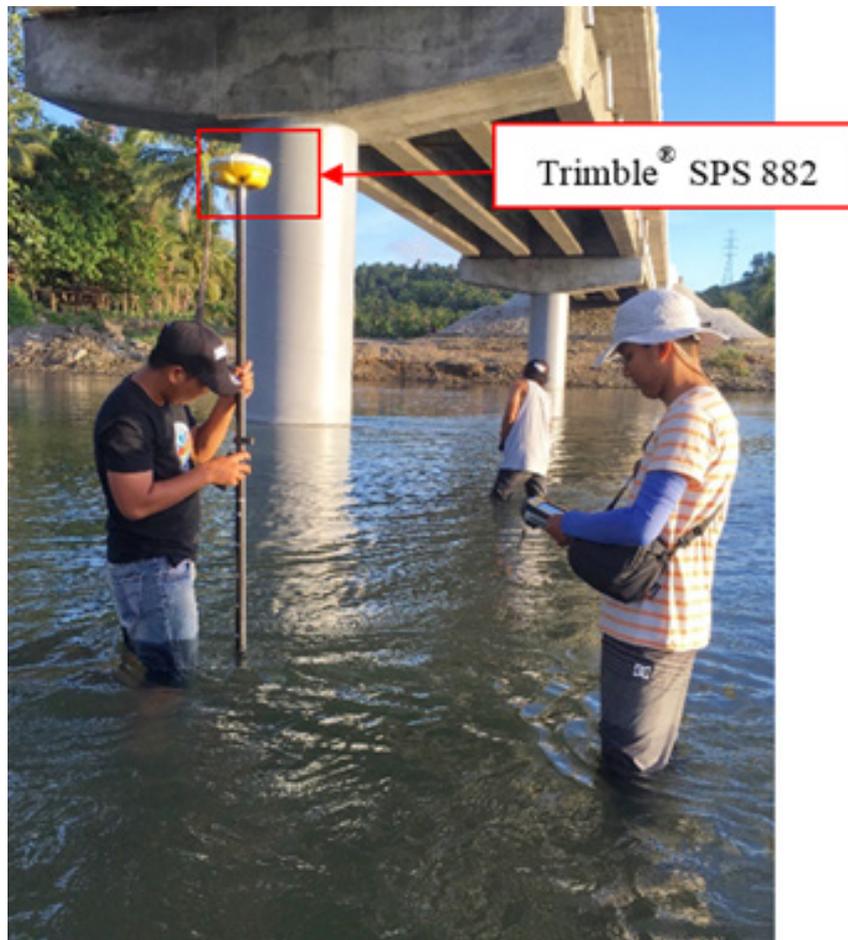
Bridge as-built and cross-section survey of Pagbanganan Bridge
